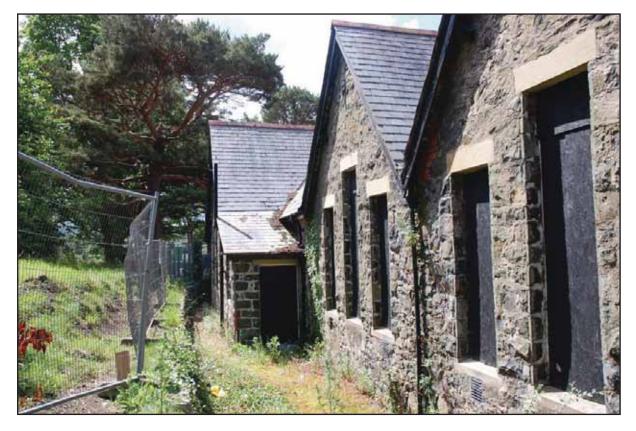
School Bank Road south building east facing elevation oblique view and ground floor entrance to room G01. Scale: 1.0m.
